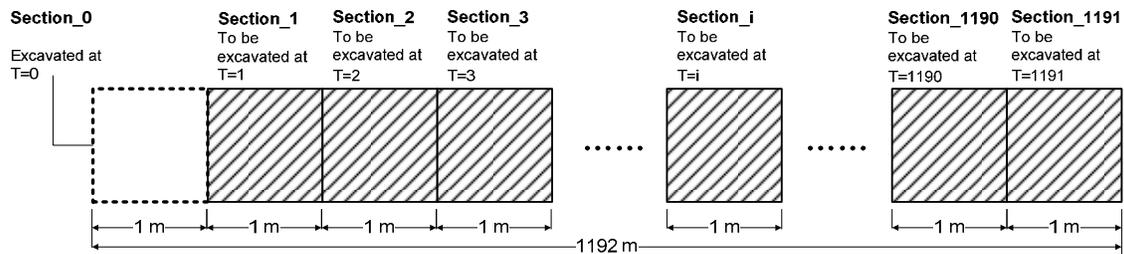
Layout of 1192 one-meter sections on construction site for the project.
